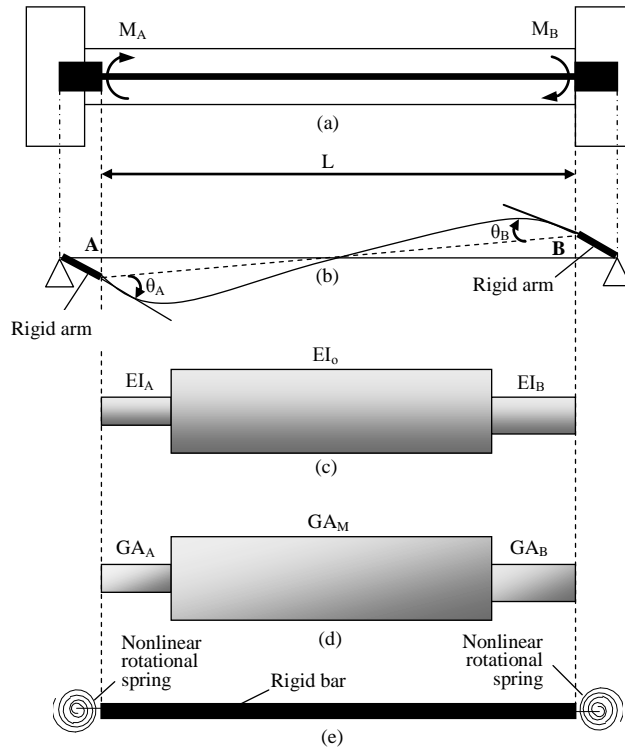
Proposed finite element model: a) geometry of R/C member; b) beam-column finite element with rigid arms; c) flexural sub-element; d) shear sub-element, e) anchorage slip sub-element.
